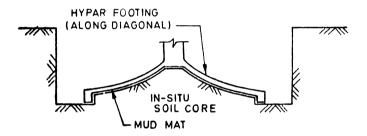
In-situ CONSTRUCTION (SECTION ALONG DIAGONAL)
